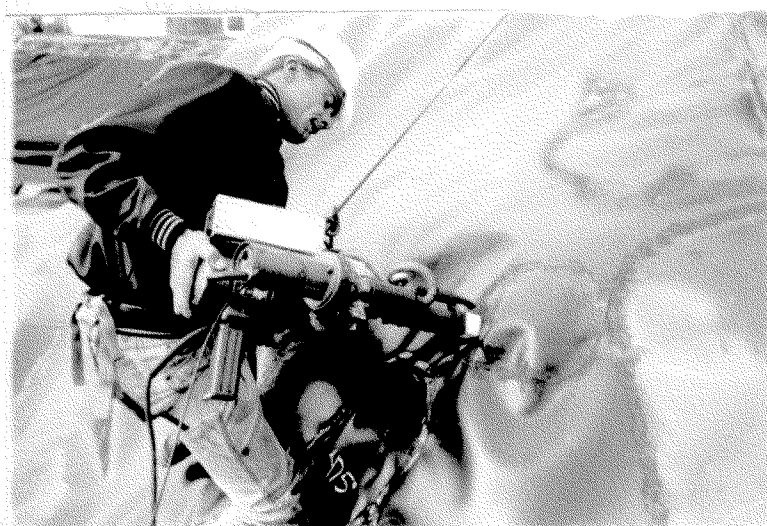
Extrusion welding of seam with 10 cm overlap
